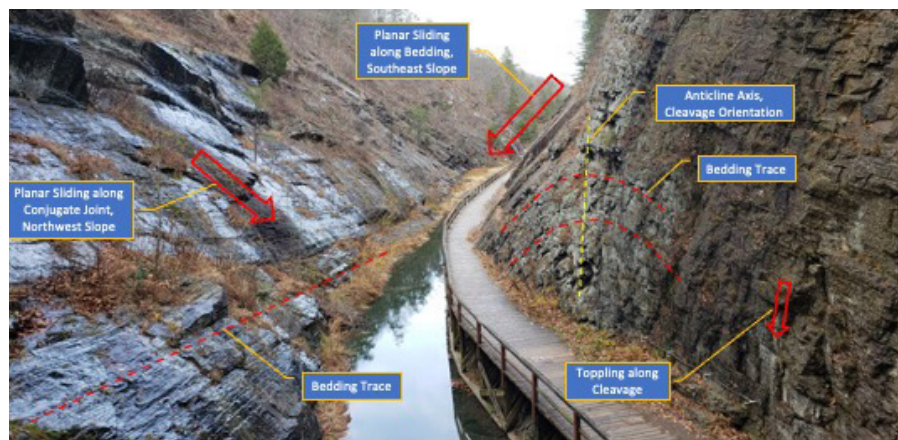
, Structural geology and slope failure elements within the canal, facing north (preconstruction).
